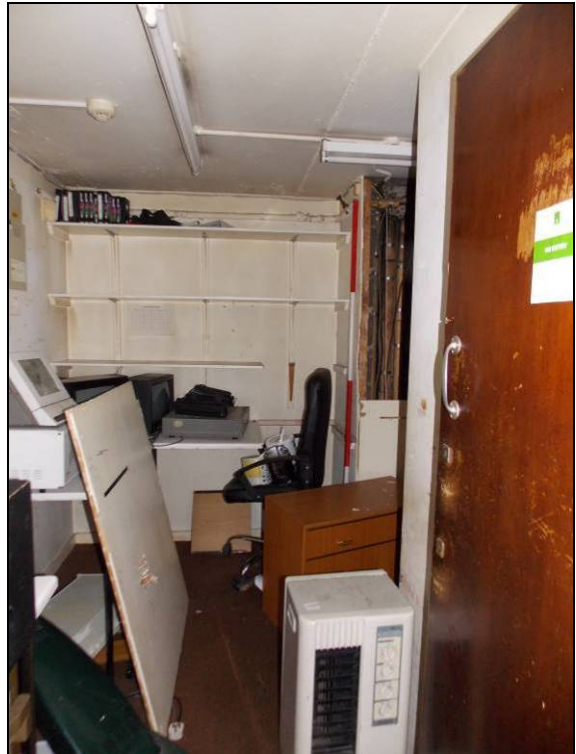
Office room within the first floor of Building D, looking west (scale 2m).
